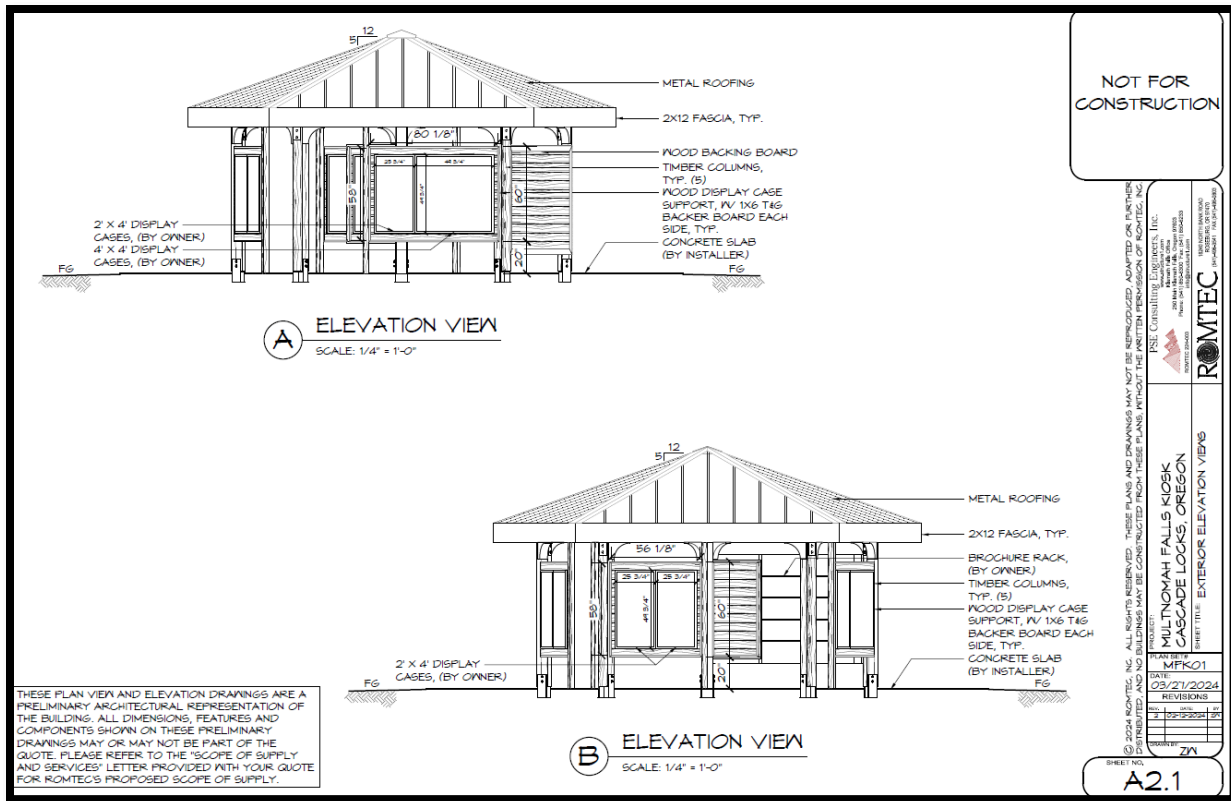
Design plans for the proposed kiosk. Image from permit application.
